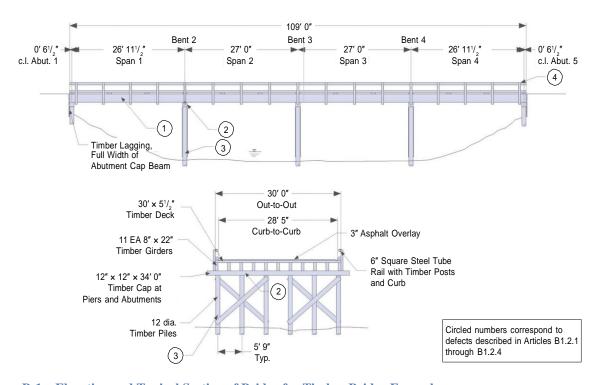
Elevation and Typical Section of Bridge for Timber Bridge Example
